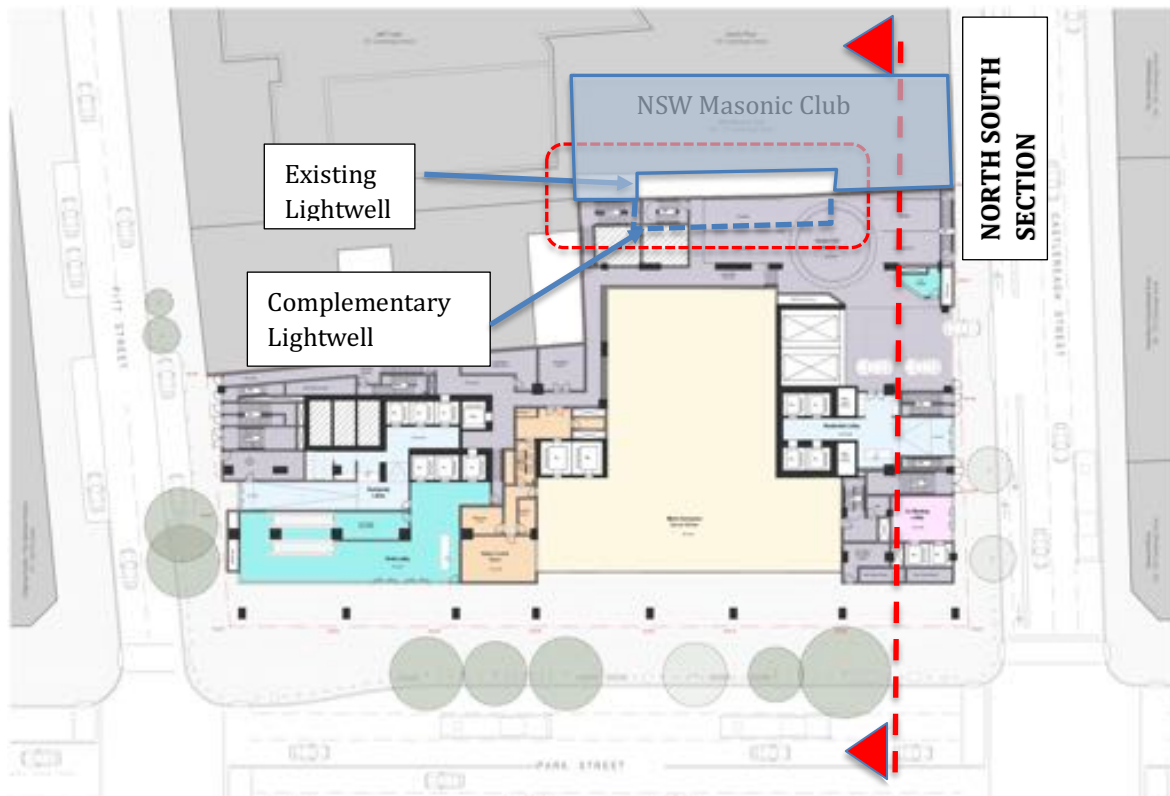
Indicative Scheme Drawings – Level 1 plan- Pitt St. North OSD. NSW Masonic Club indicated with blue outline. *Pitt Street North OSD Concept Application. Appendix F-Built Form and Urban Design Report. Architectus. 2018.
